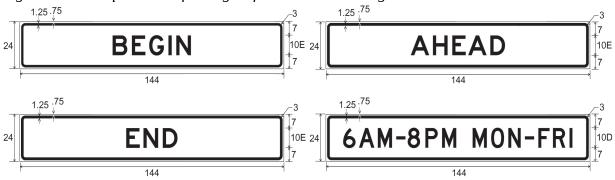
Plaque details for overhead left lane truck restriction sign
